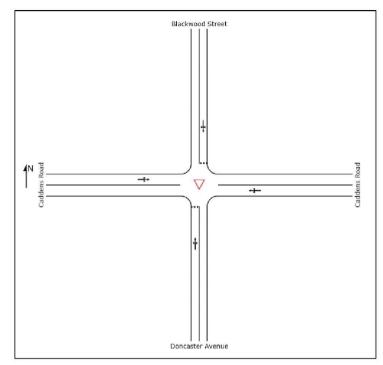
Priority-controlled intersection of Caddens Road with Doncaster Avenue and Blackwood Street (SIDRA)
